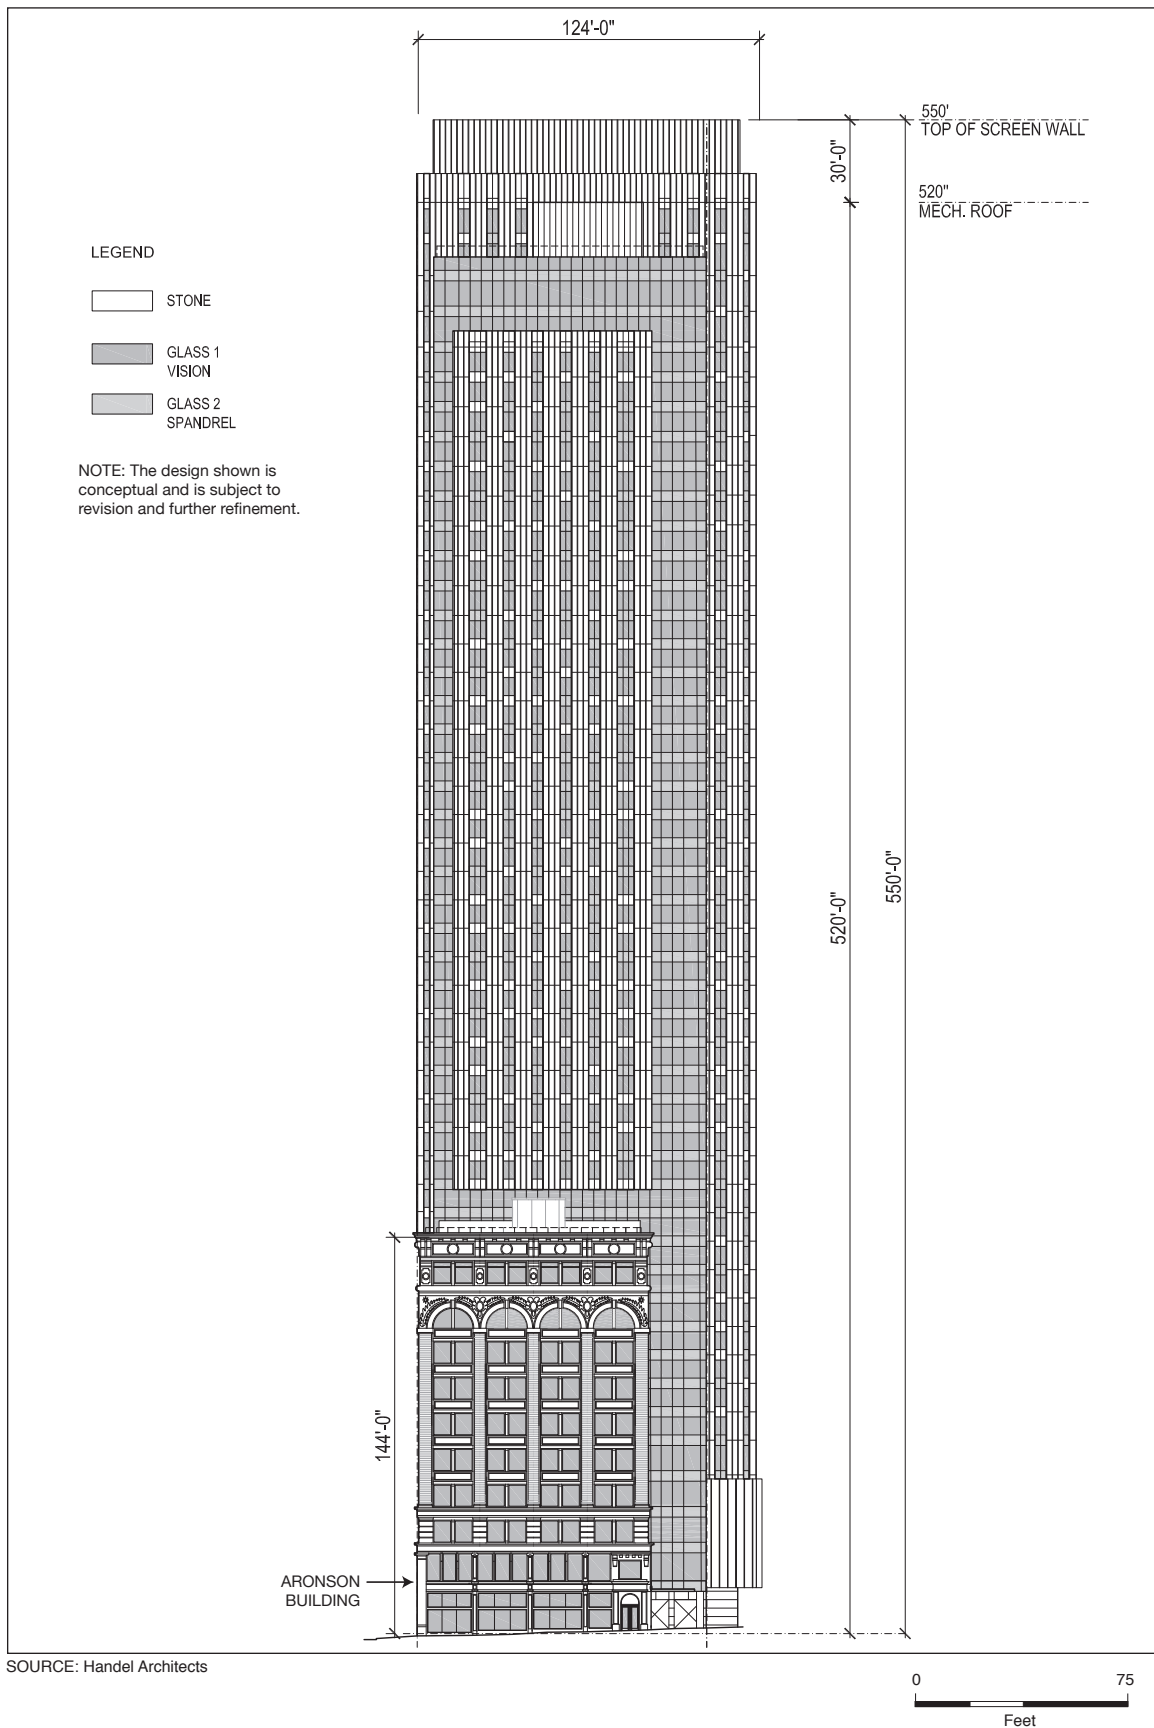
CONCEPTUAL WEST ELEVATION
